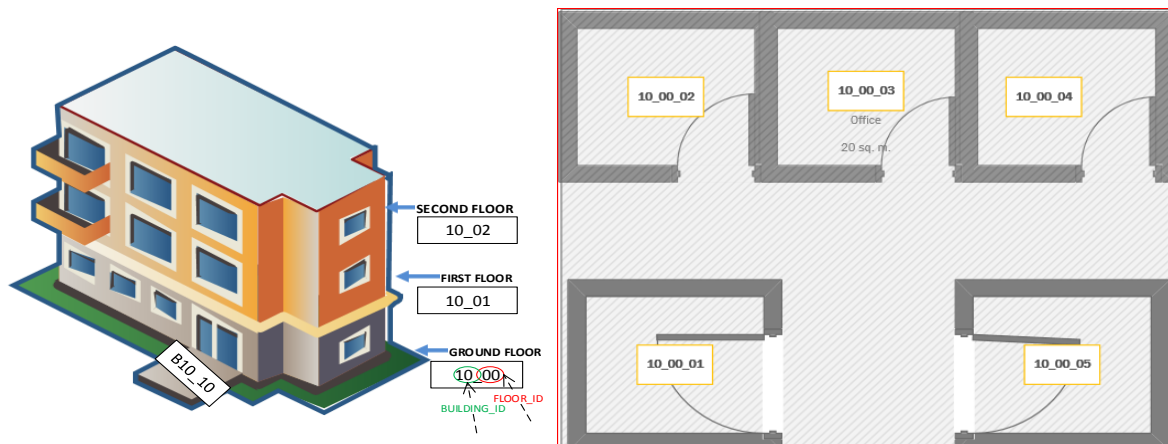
Numbering of multiple buildings on a single parcel, floors, and sections
